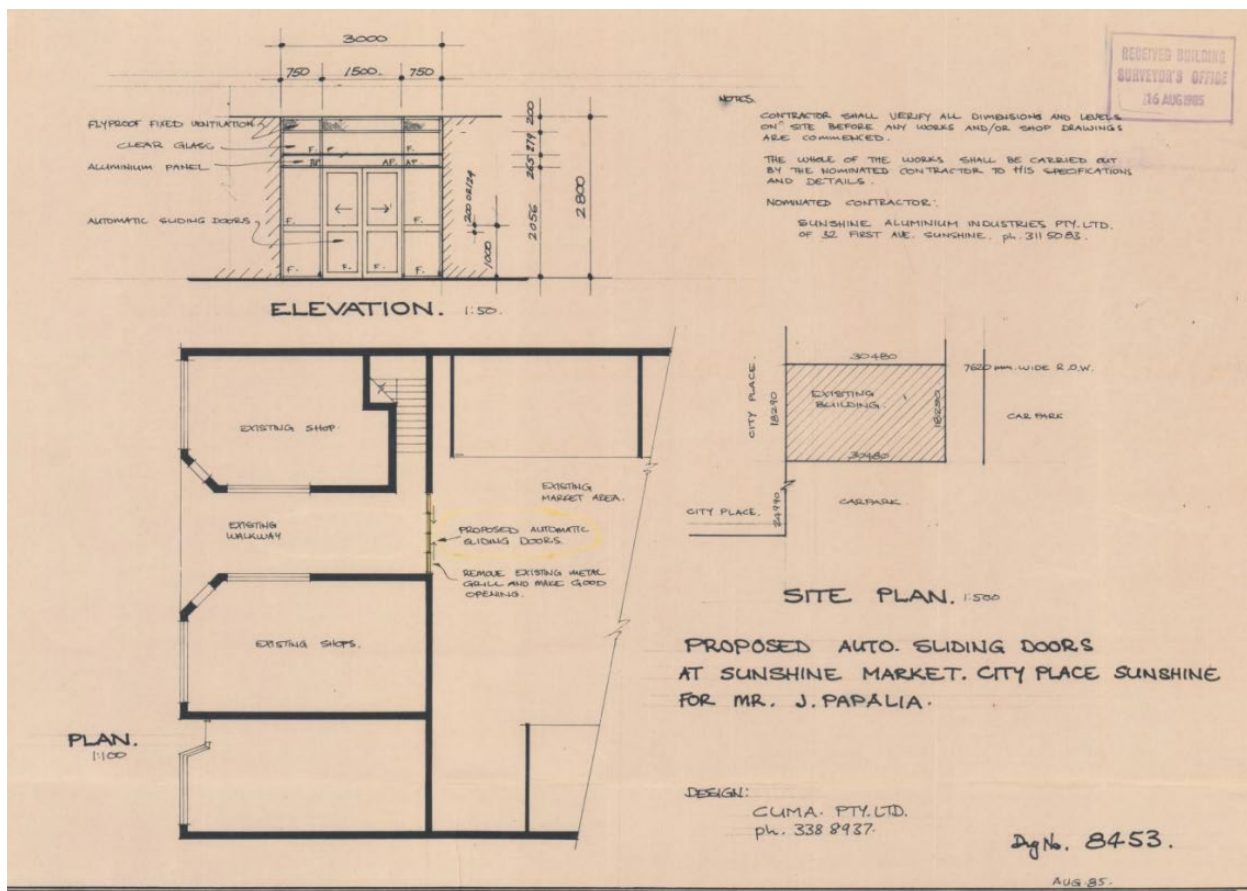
Site plan showing twin shop fronts, walkway and proposal for automatic doors, 1985 (Supplied with application).
